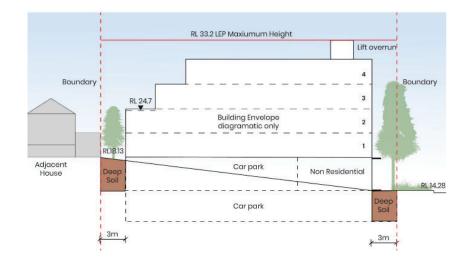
Indicative elevation along Lonsdale Street in the Draft DCP
